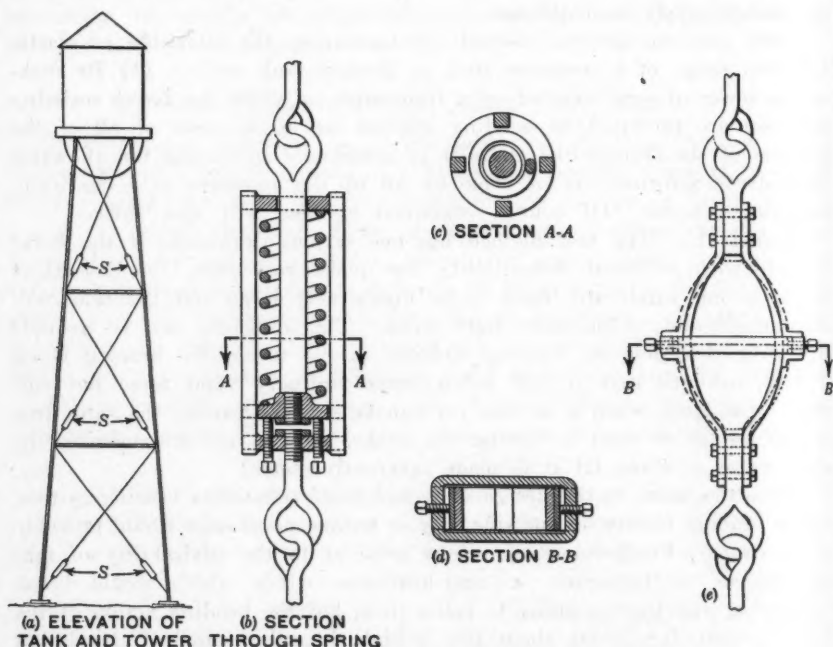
SPRING ELEMENT CONSTRUCTION (SCHEMATIC)
